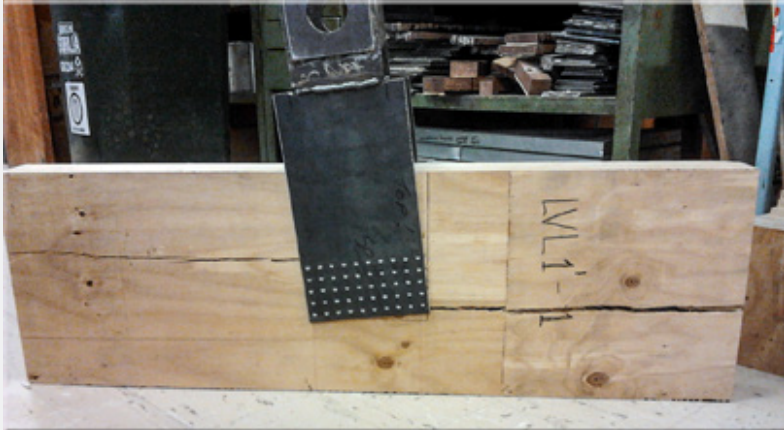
Experimental setup showing crack pattern of a moment resisting connection with external steel plates (c/o Pierre Quenneville, University of Auckland).
